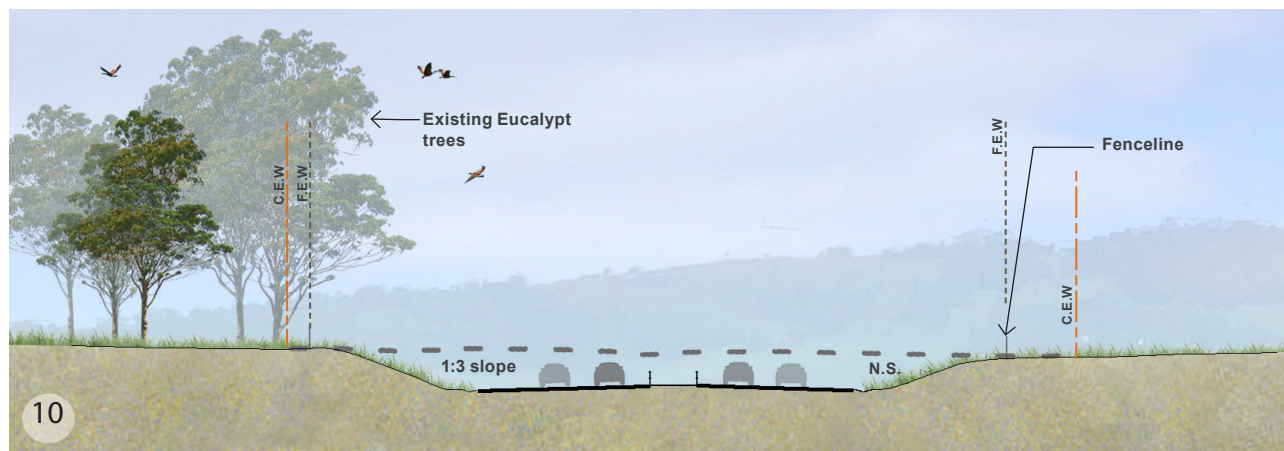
Elevation / section 10 - Berry - chainage 18350
